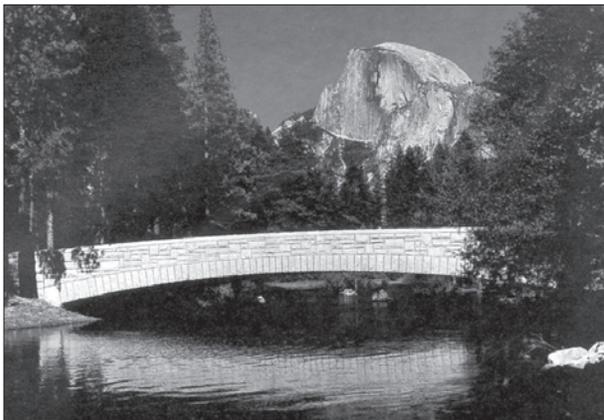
The 1994 reconstruction of Yosemite's Sentinel Bridge used masonry facing and a traditional arch profile to contextualize a modern concrete girder structure. (FHWA 1994)
